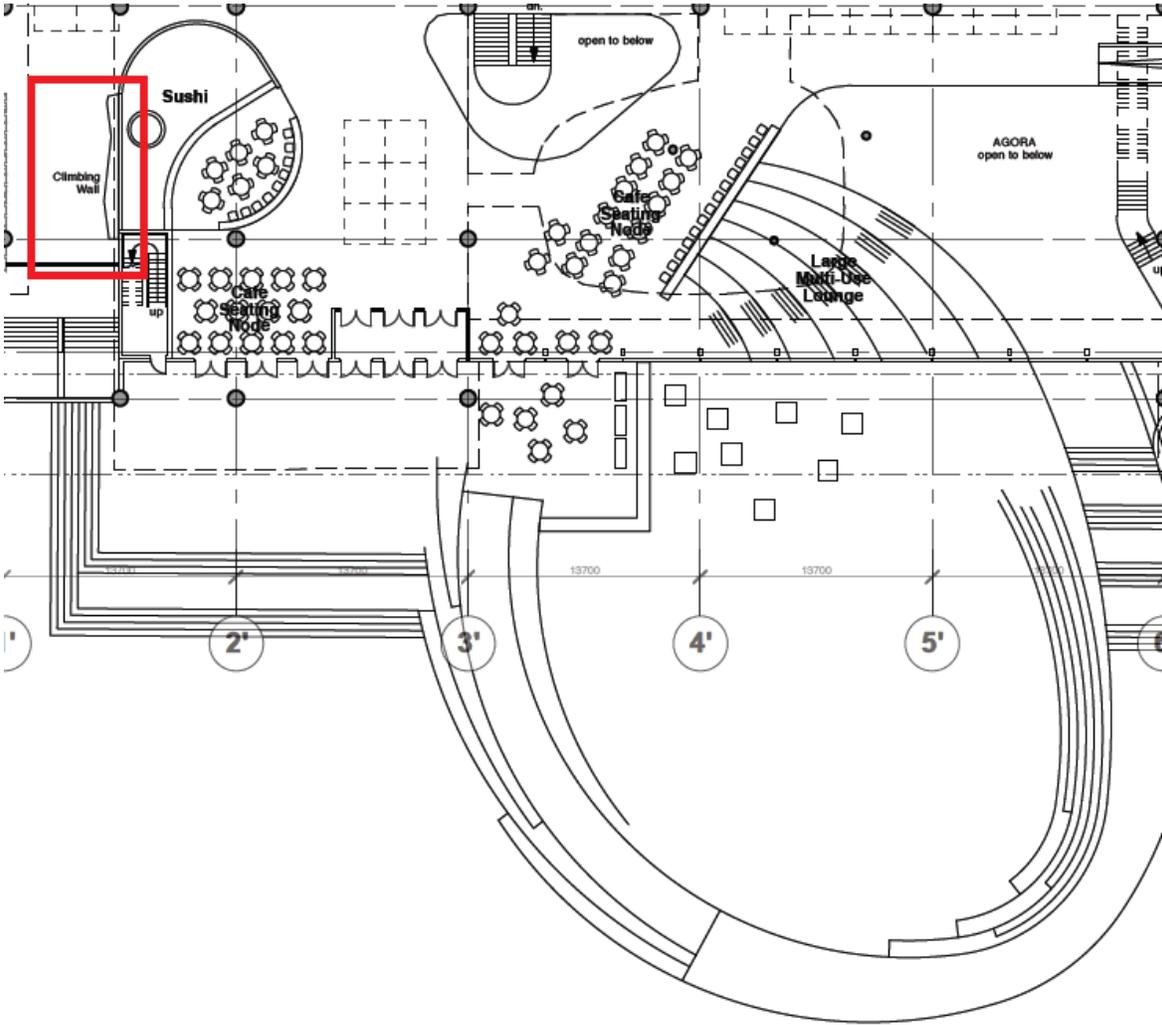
New SUB level 2 (Main Floor) floor plans. Climbing Wall is showed in red (“UBC,” 2011)
